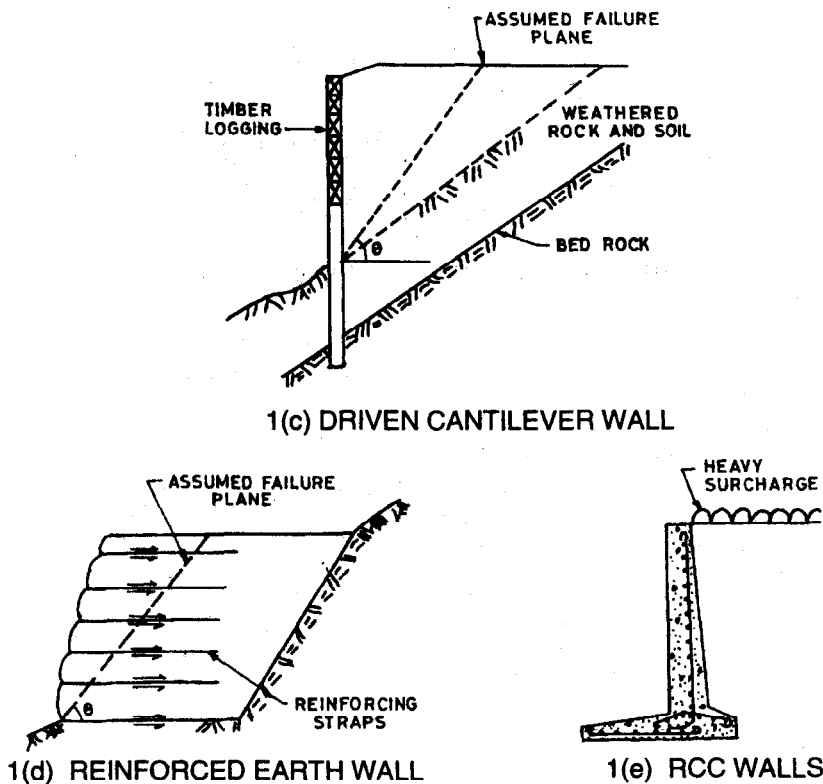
DIFFERENT TYPES OF RETAINING WALLS
